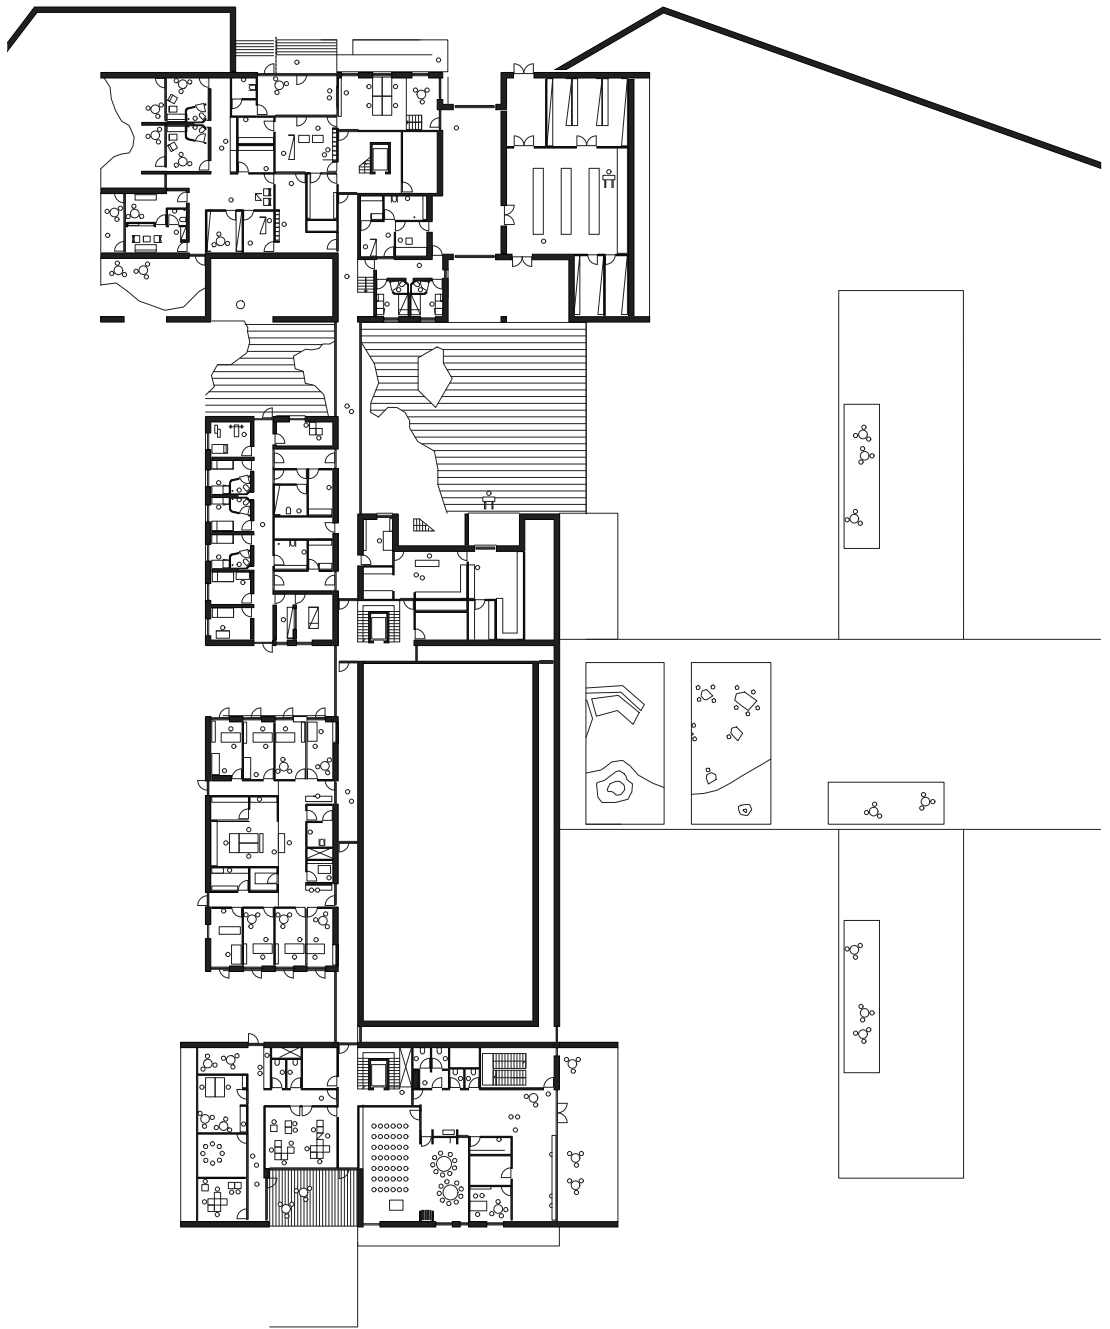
New Correctional Facility in Nuuk, Greenland, by Schmidt Hammer Lassen architects, 2018. Ground floor plan.
